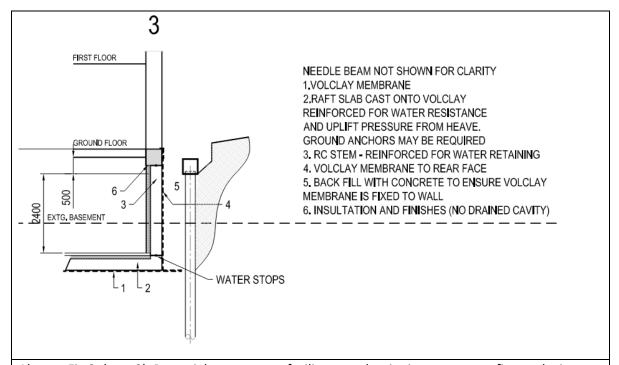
shows a possible sequence of works that would facilitate underpinning works, installation of suitable waterproofing and lowering the basement floor slab level to facilitate a suitable internal height for commercial activities and associated services. As can be appreciated, this will be a costly and time consuming piece of work.
